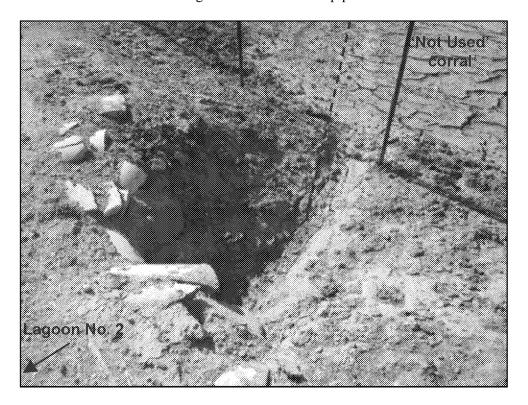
View facing west of standing water on the south side of disposal field No. 2 and basin No. 3, upgradient of the PVC pipe connection which drains into lagoon No. 2.
